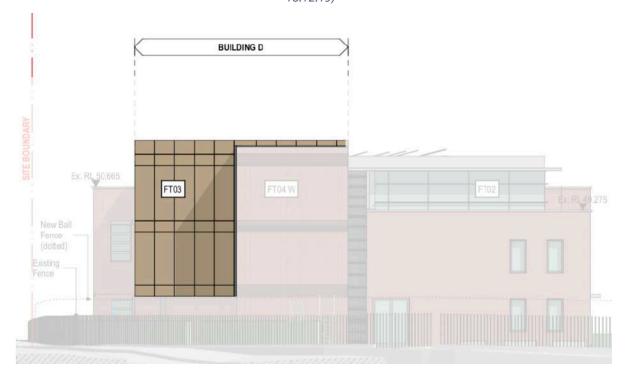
Building D façade, western elevation (Source: FJMT, DA-5902 Facade Diagrams FT03 Building D, 18.12.19)
